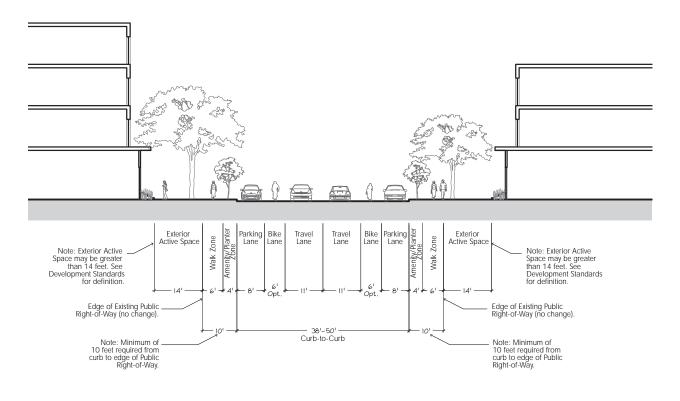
Typical Neighborhood Street Section (D-D)
